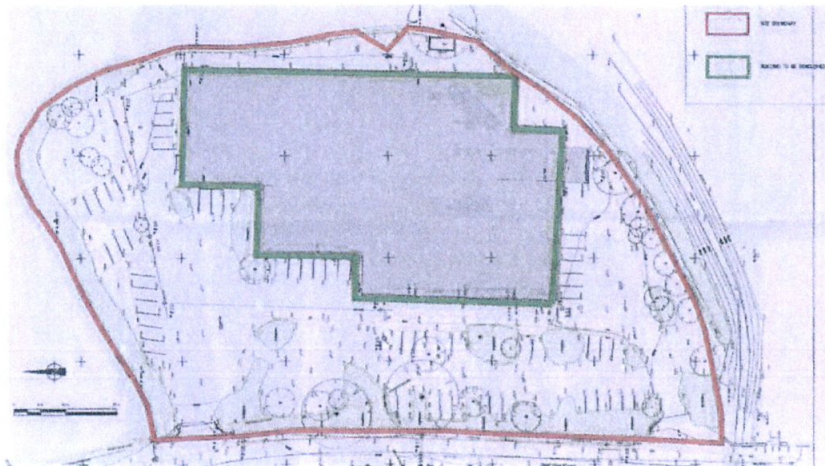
Layout of Previous Factory Showing Extensive Staff Car Parking
